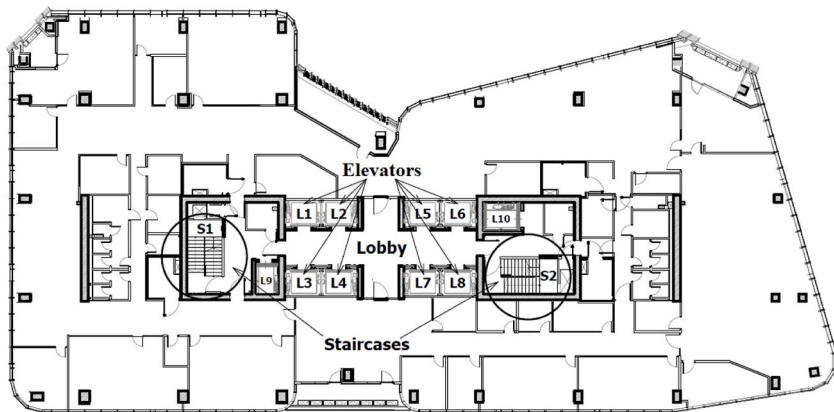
Floor and evacuation staircases configuration provided by the owner.
